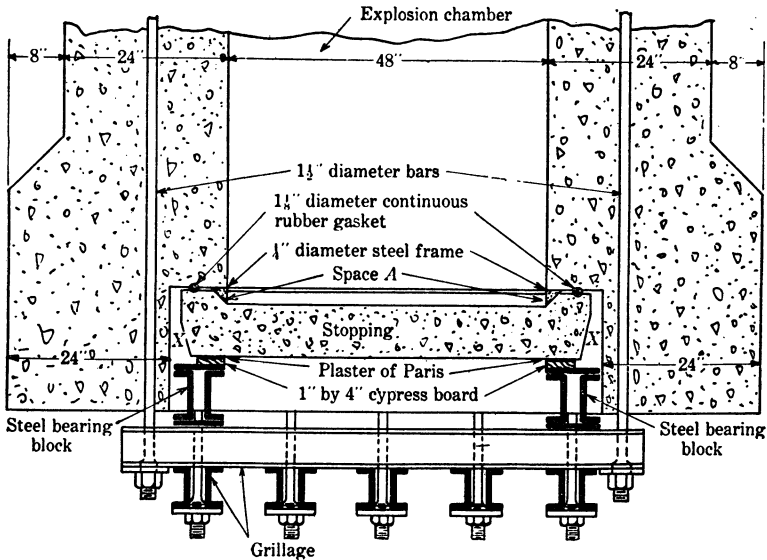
Horizontal cross section of front half of test chamber at Bureau of Standards
